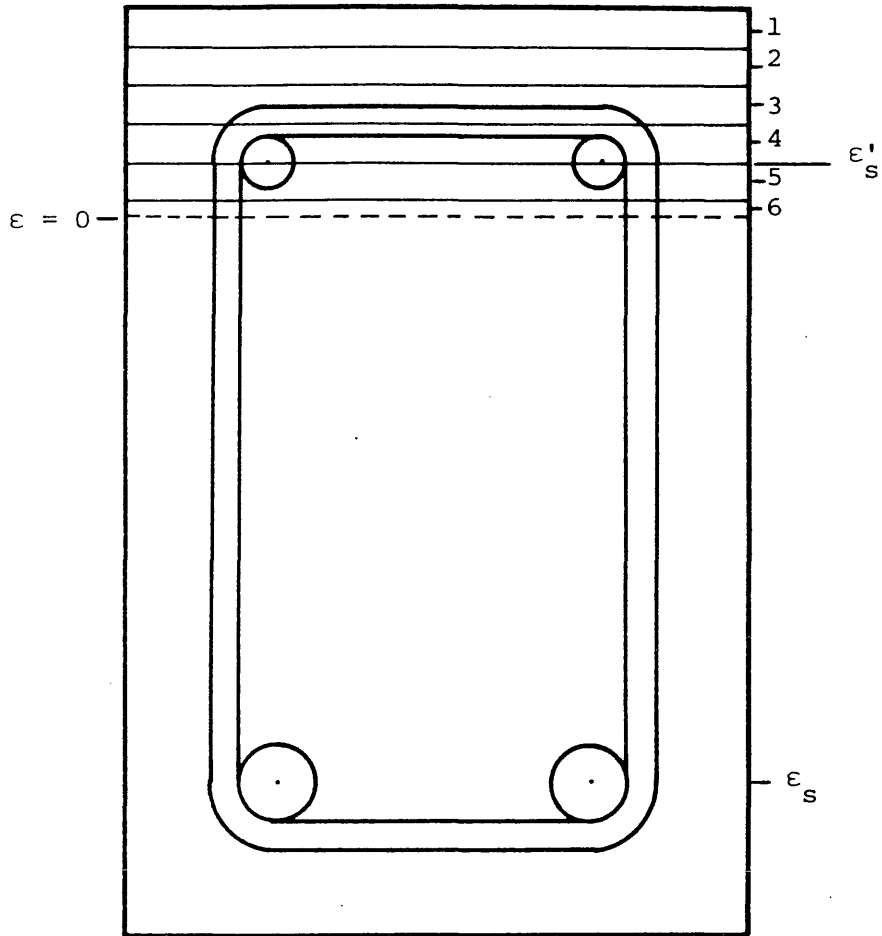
Beam J-2 cross section for Case 4.
